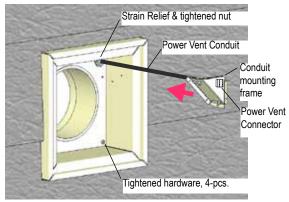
(Installing Conduit connector & conduit mounting frame)
